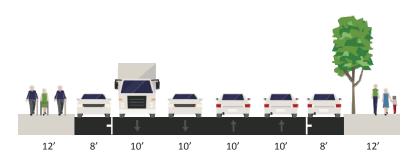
Jefferson Street Typical Cross-Section, between Madison Street and Twiggs Street
